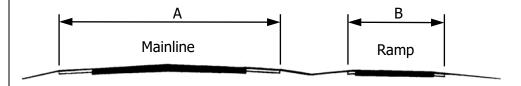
Approach roadway cross-section view for a mainline and a ramp that are carried across one bridge.
